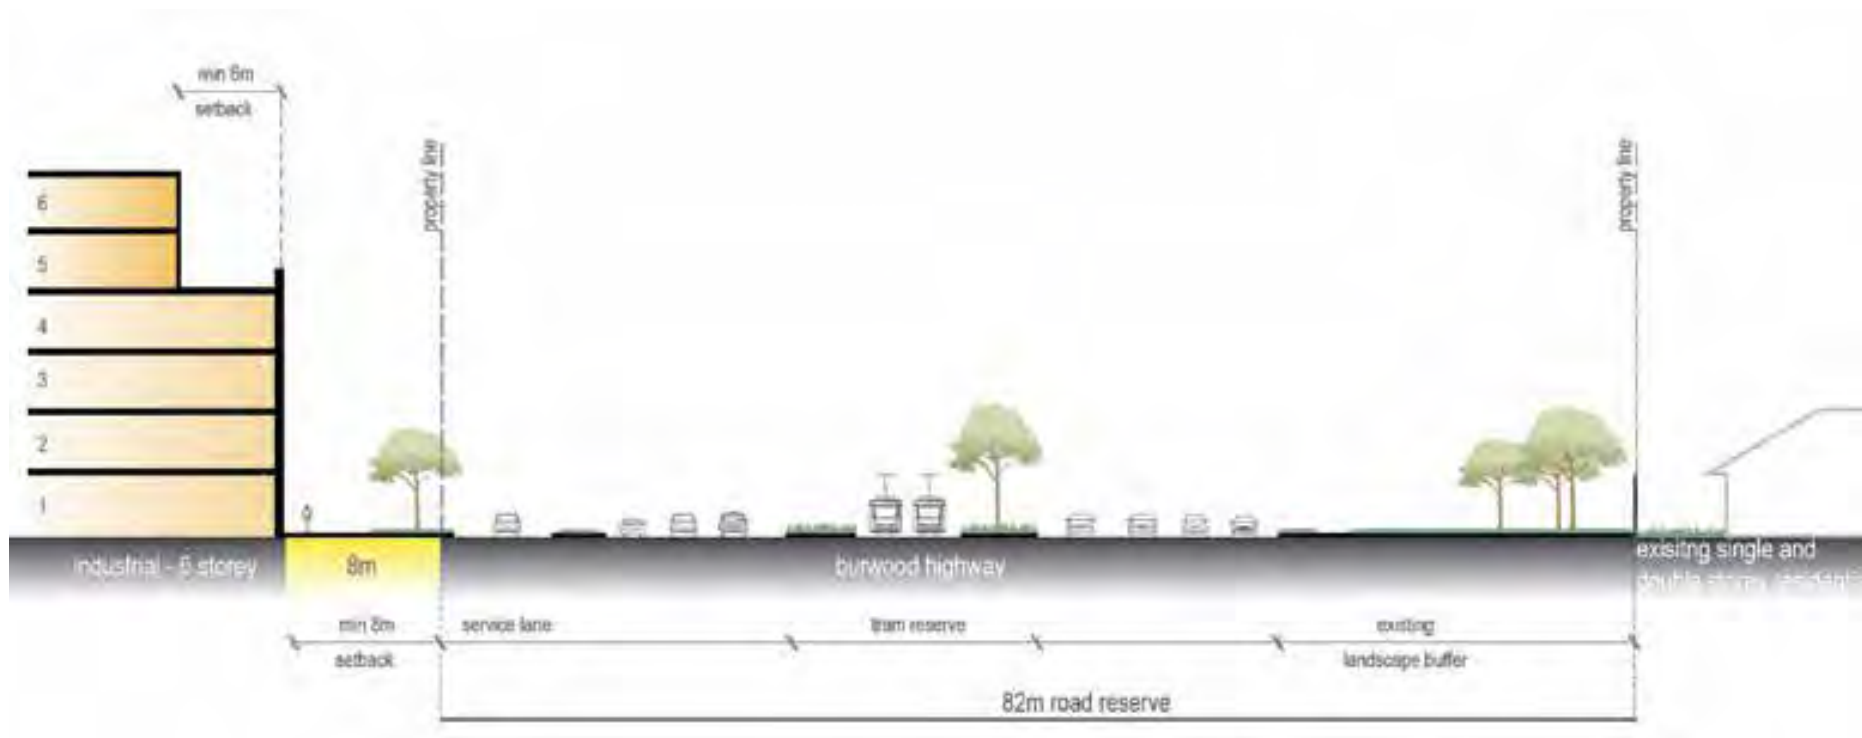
Section Diagram Lewis Road Industry Burwood Highway Interface (section e)
